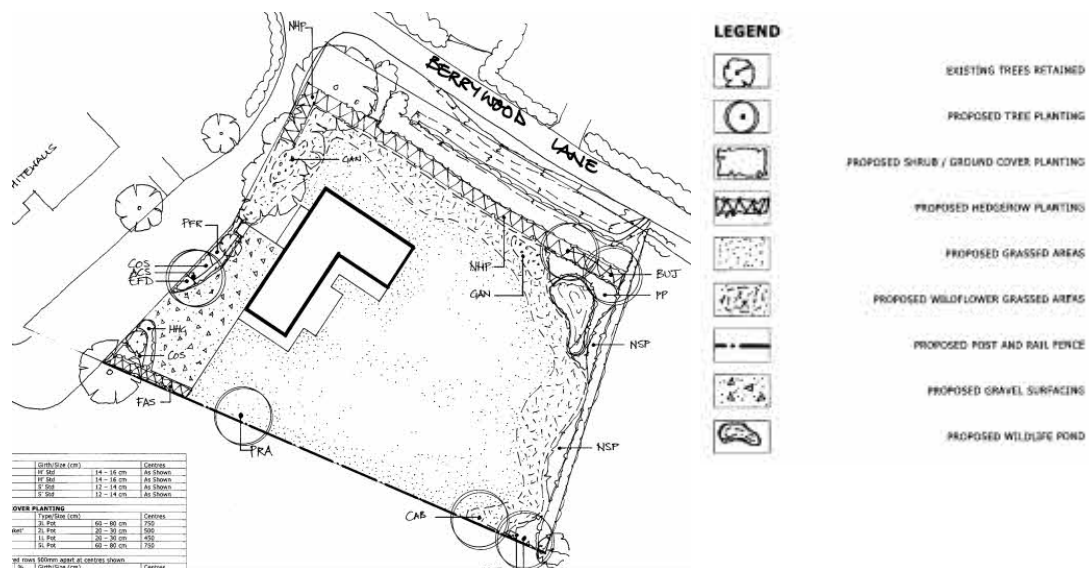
Extract of Indicative Landscape Proposals Plan.
